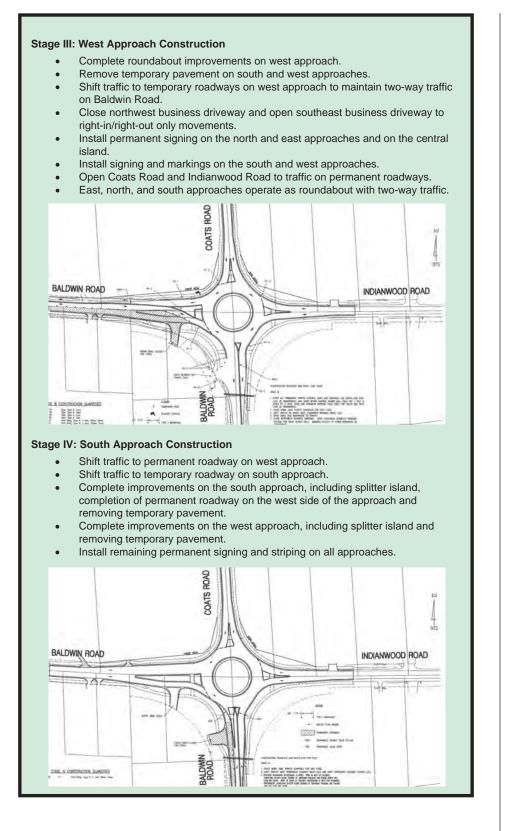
(cont.) Example of Construction under Partial Traffic
